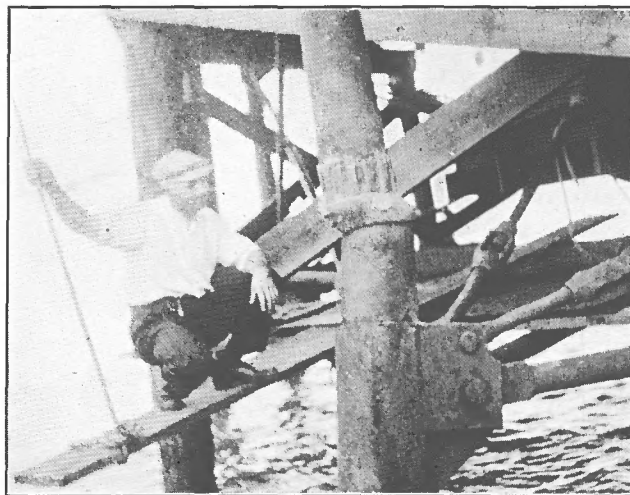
One of the completed welds. The columns were purposely left offset.
